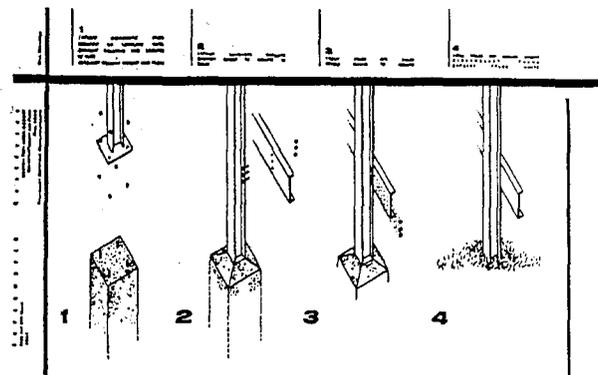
Mies Van der Rohe. Farnsworth House. Detail showing how bolts necessary for assembly are later cut off for clean appearance. Drawing by Bill Beuter.
